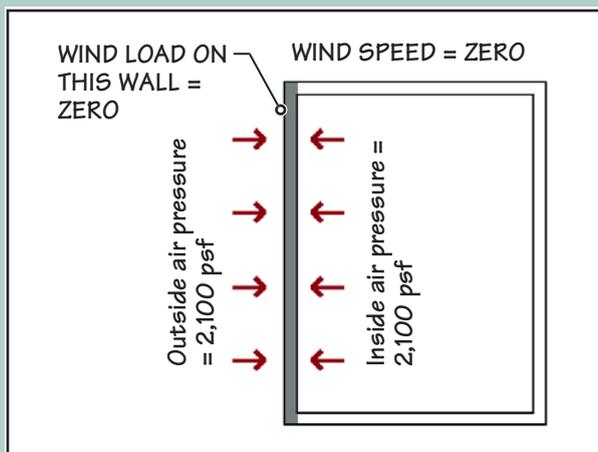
Outside and inside air pressures on a wall under zero wind speed.
